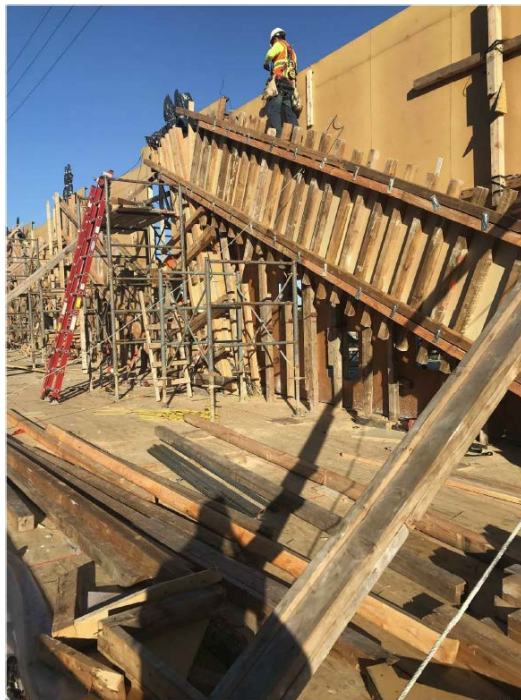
November 3, 2017: Truss Web form closure.⁸⁰
